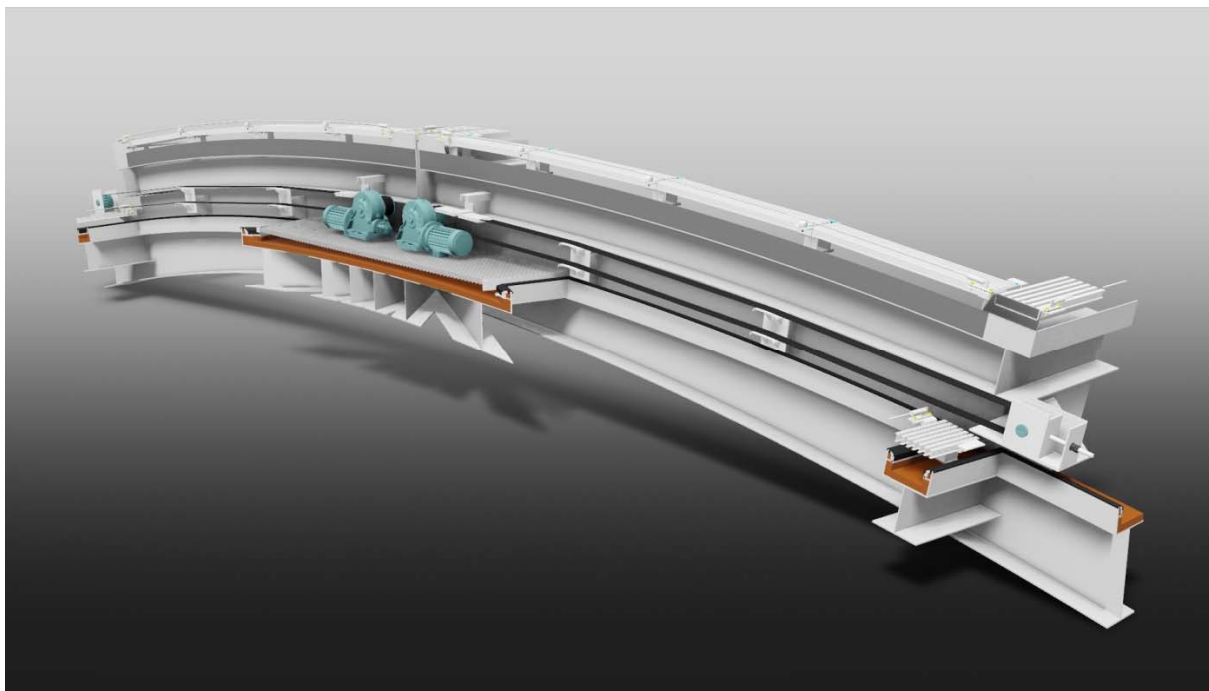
“Four Elements” foil dome, drive mechanism for movable roof segment; 3D computer image, draft design, seele cover
